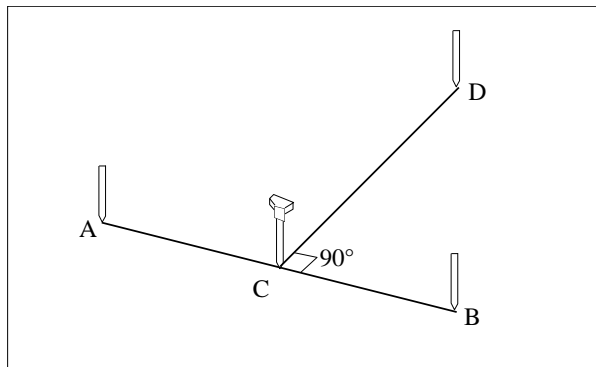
Erecting a perpendicular using the optical square with double prism.
